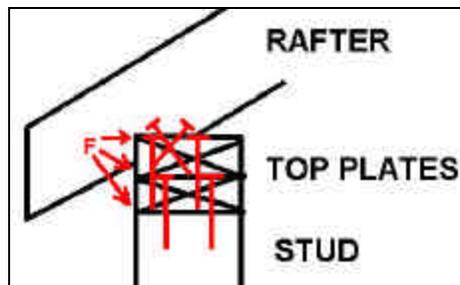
Typical cross section of roof/wall top plate showing nailed connections and common failure points (in red).
